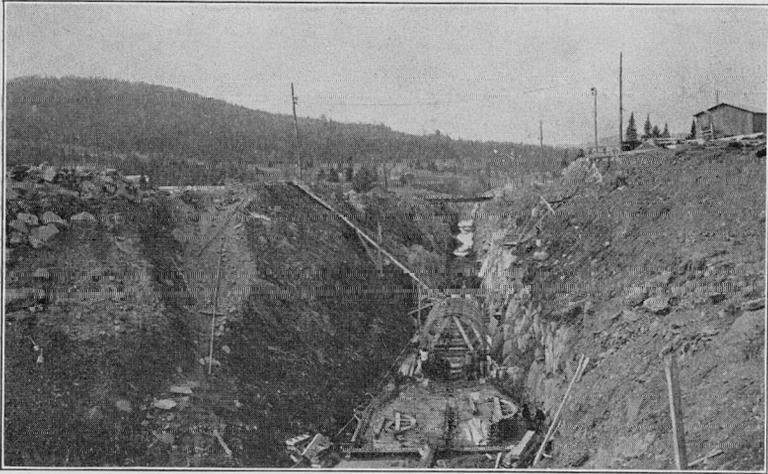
CONDUIT TRENCH EXCAVATION WITH BEGINNING OF CONCRETE FORM-WORK
